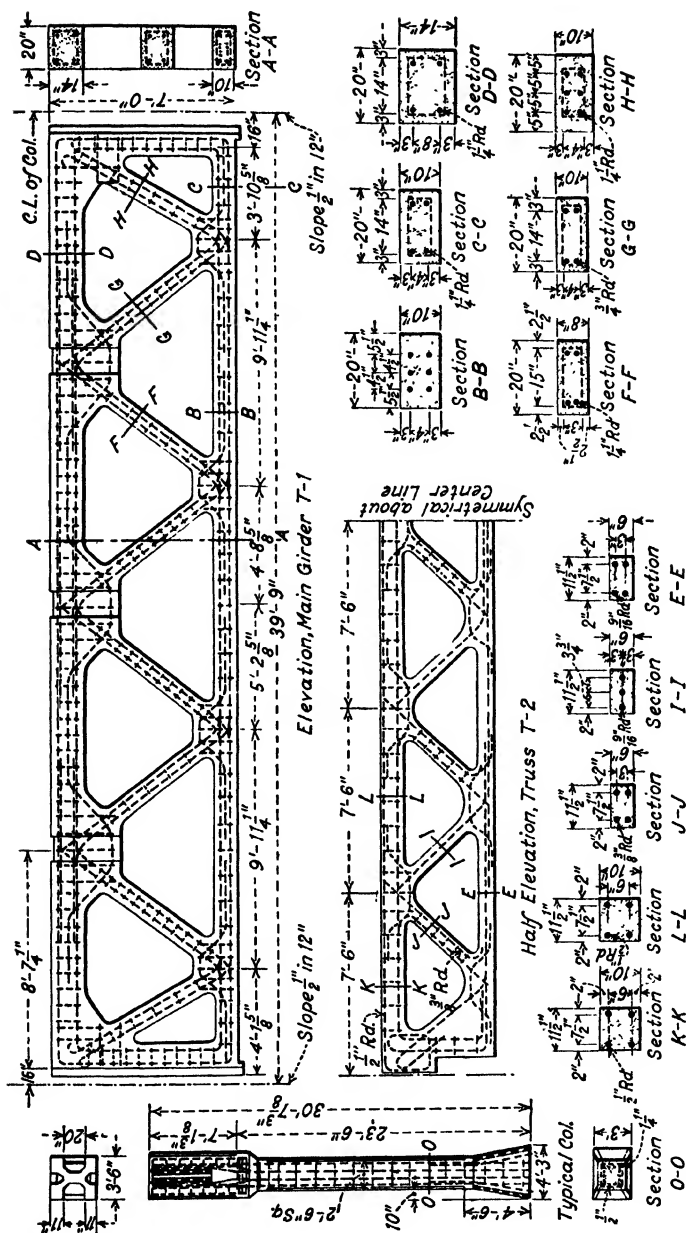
Details of Pre-cast Roof Trusses, Pier 6, at Cristobal, Canal Zone. (See p. 677.)
